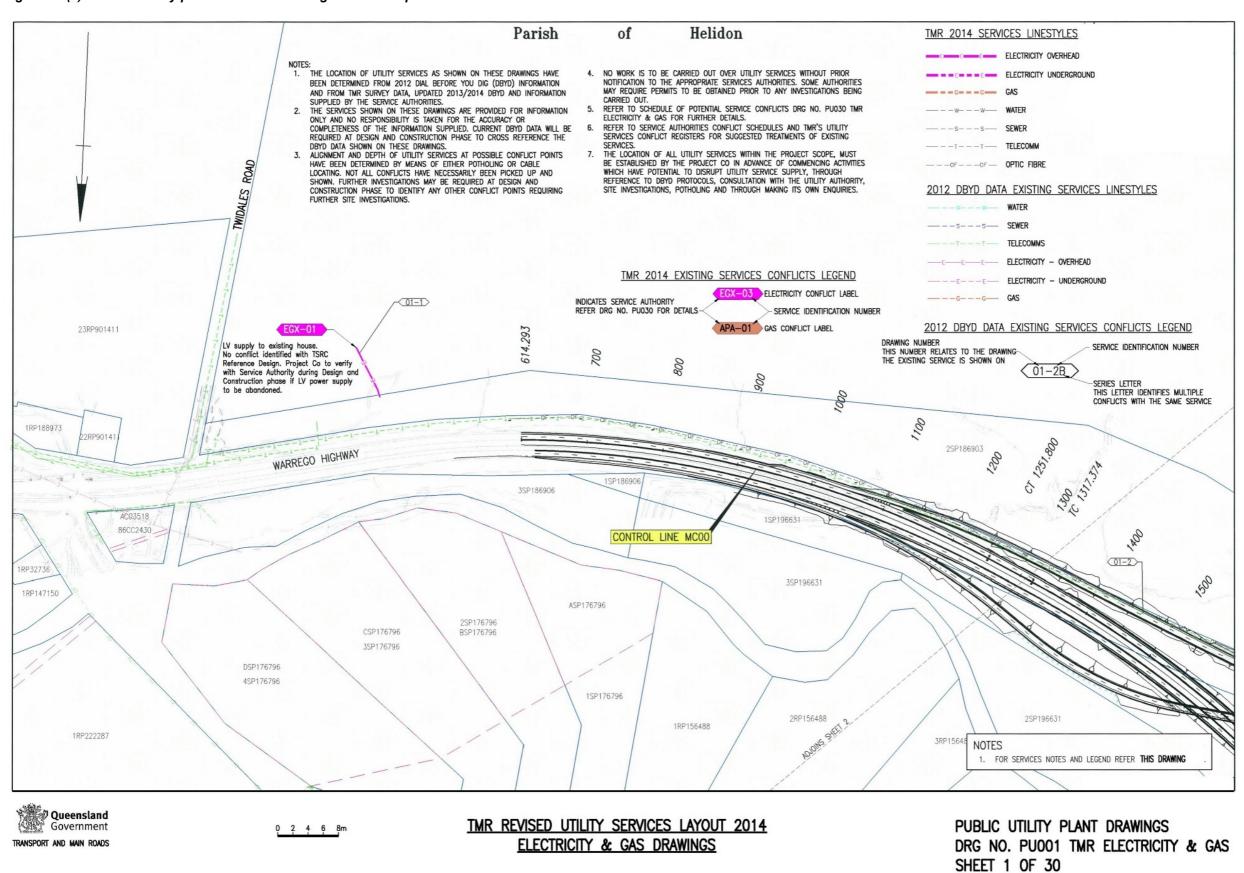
(I) – Public utility plant – Conflict Plans generic example – sheet 8 of 11
